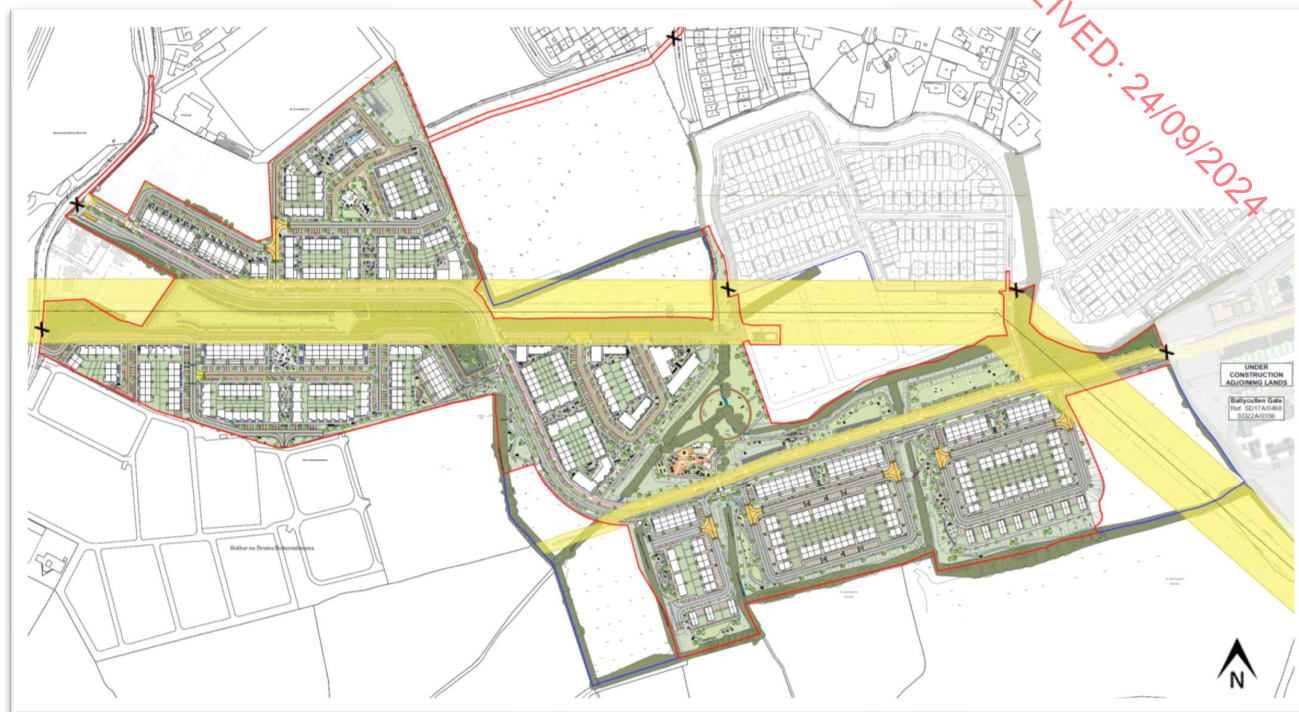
Site Layout Plan being put forward for permission as a LRD proposal
